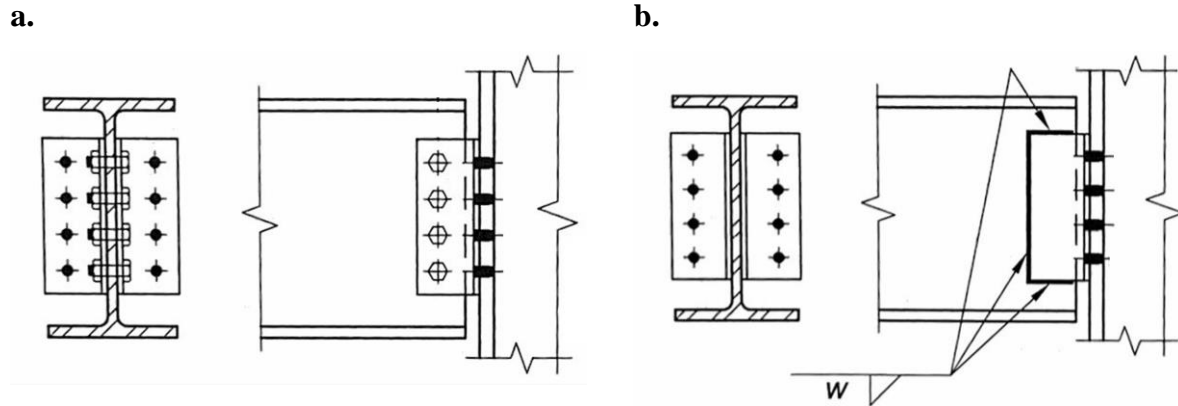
Double Angle Connections (a) Bolted-Bolted and (b) Bolted-Welded (AISC, 2022)
